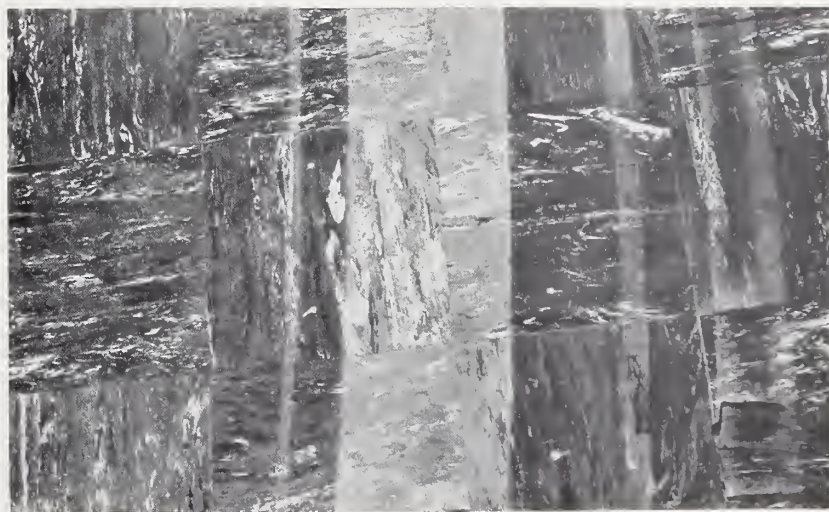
$\frac{1}{8}$ -in. rubber tile on concrete subfloor (test panel 5R).
